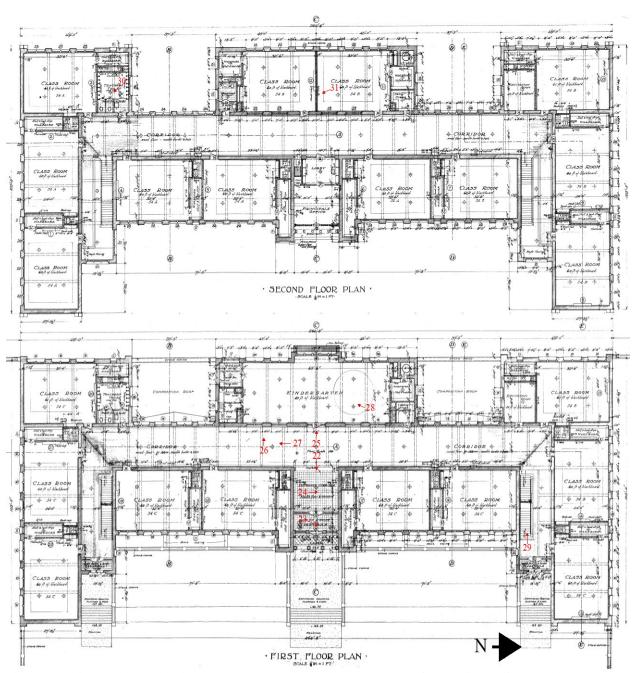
First and Second Floor Photo Keys (Floor Plans Courtesy of St. louis Public Schools)
